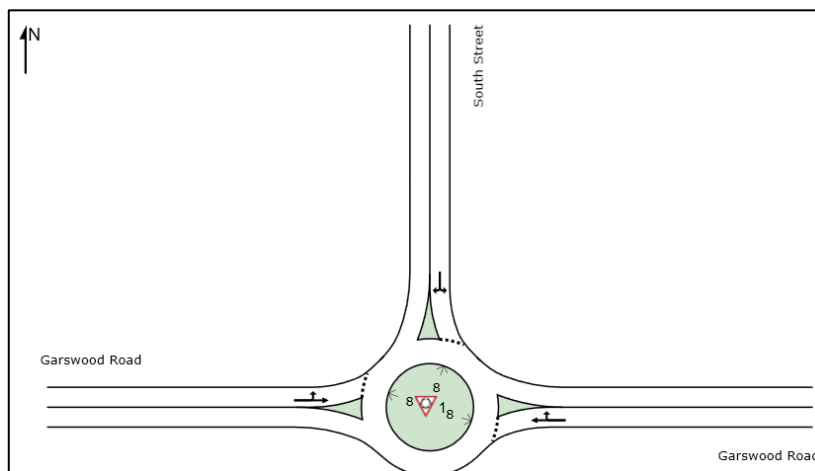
Roundabout intersection of Garswood Road with South Street (SIDRA)
